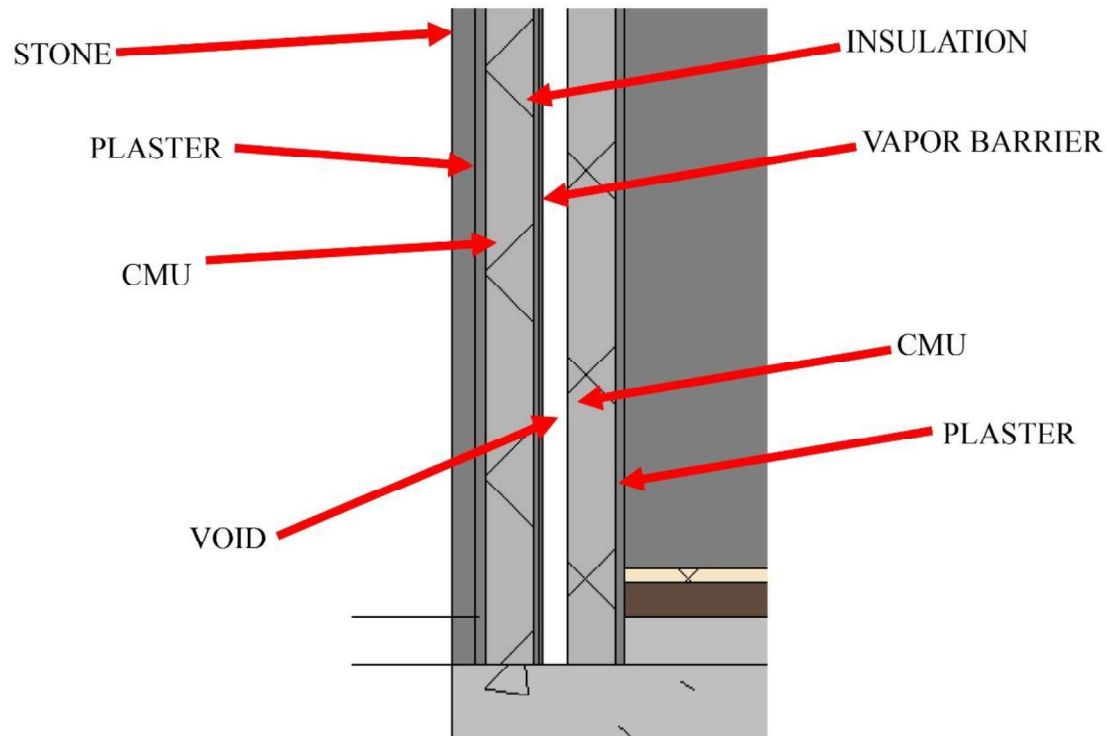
Wall section showing construction materials. Source: Revit Autodesk 2020 by Author
